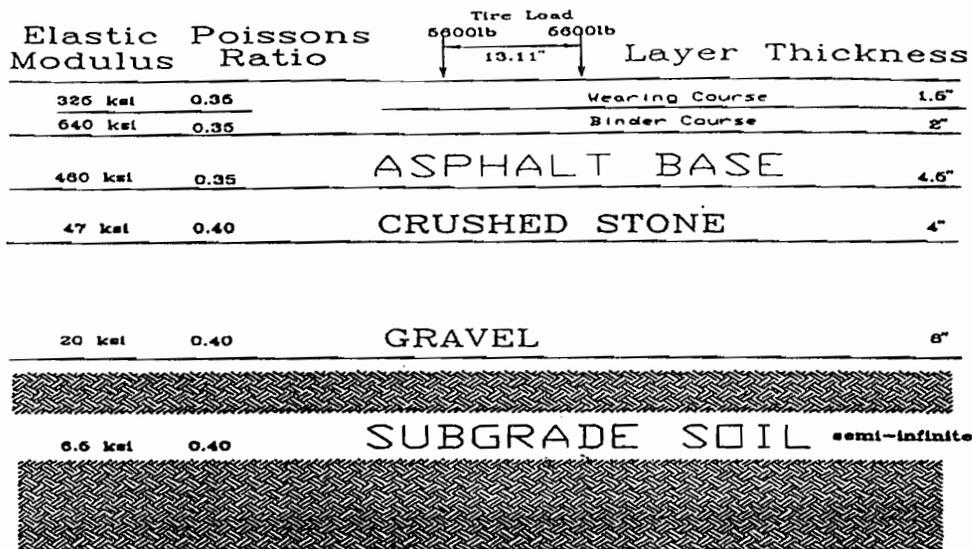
Typical Cross Section of Pavement Structure for the State of Massachusetts
